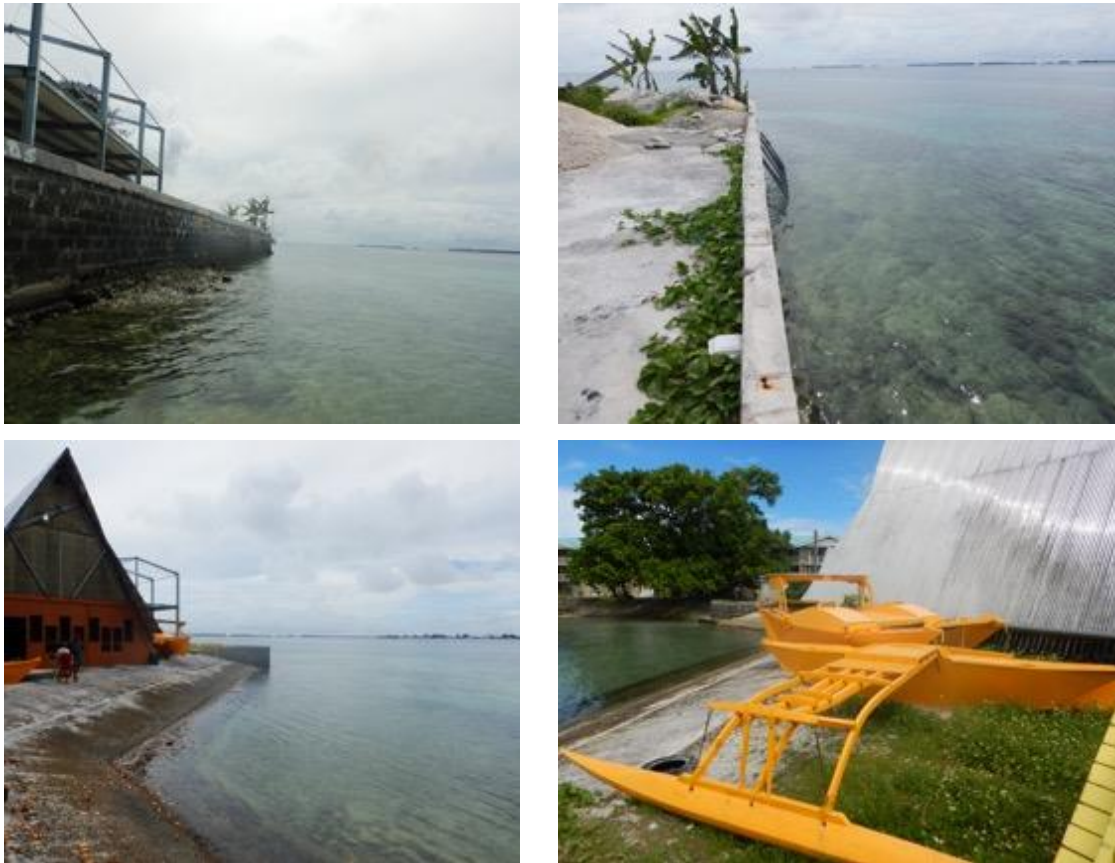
WAM site and associated infrastructure adjacent and east to the project site.
